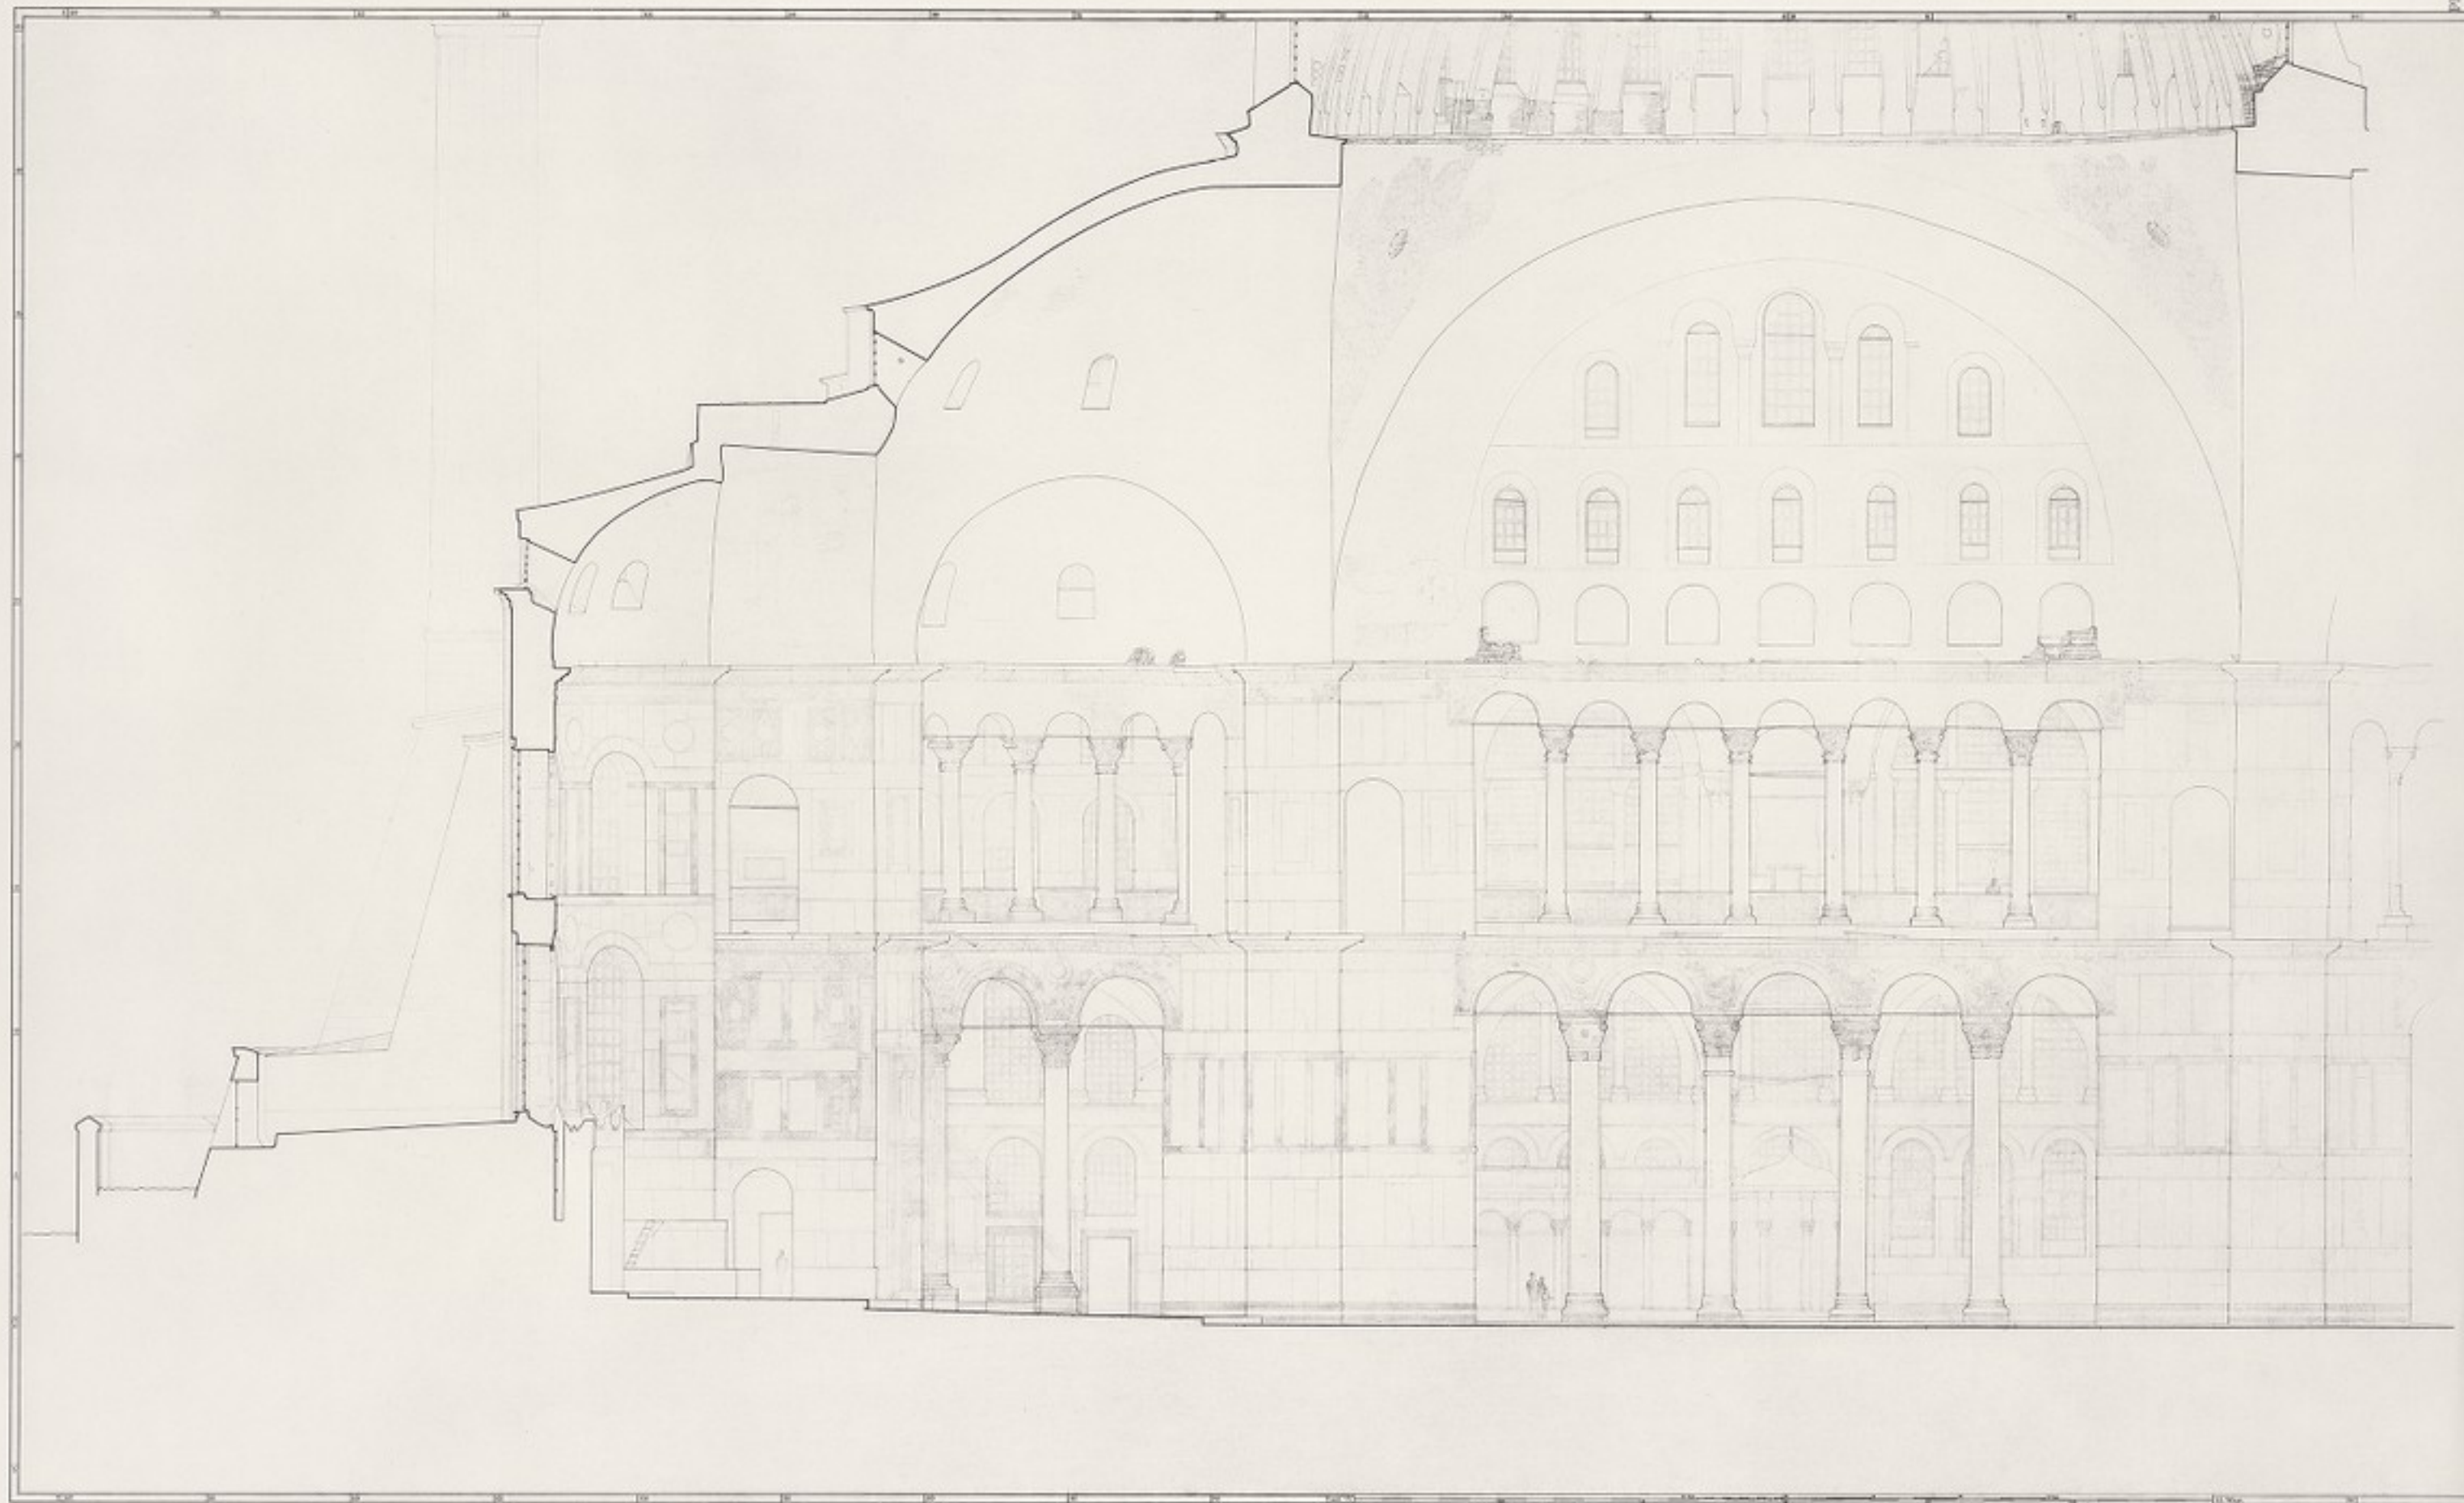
LONGITUDINAL SECTION, LOOKING SOUTH
